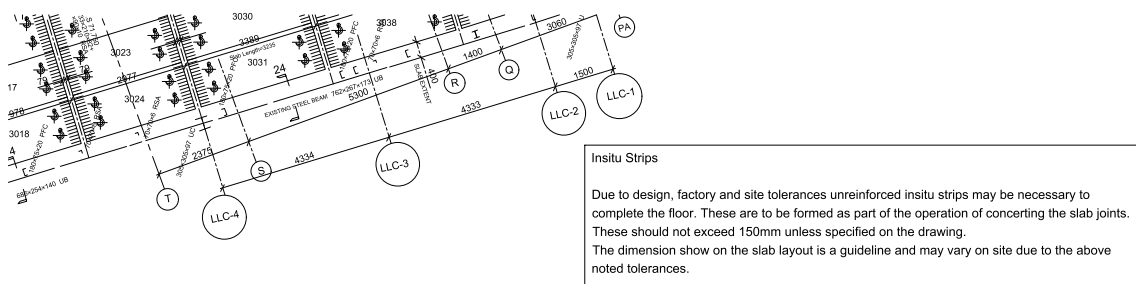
Tolerances displayed on drawings for tiles
